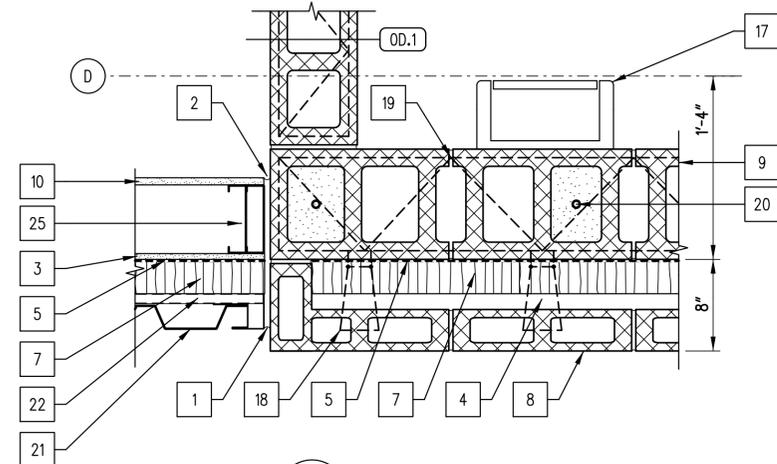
DETAIL APPLIES ONLY ABOVE ELEVATION 48.53'
